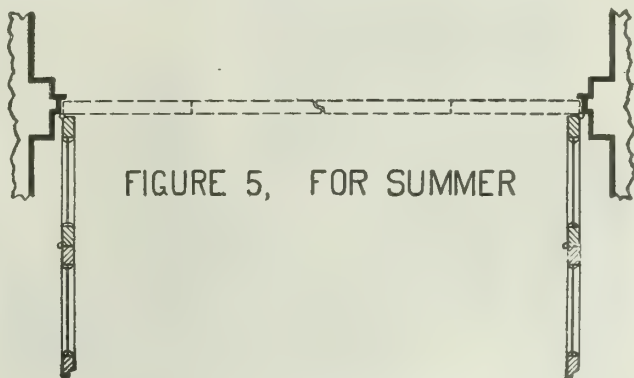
UNIVERSAL BALANCE DOOR HINGED TO TWO FOLDABLE PANELS
